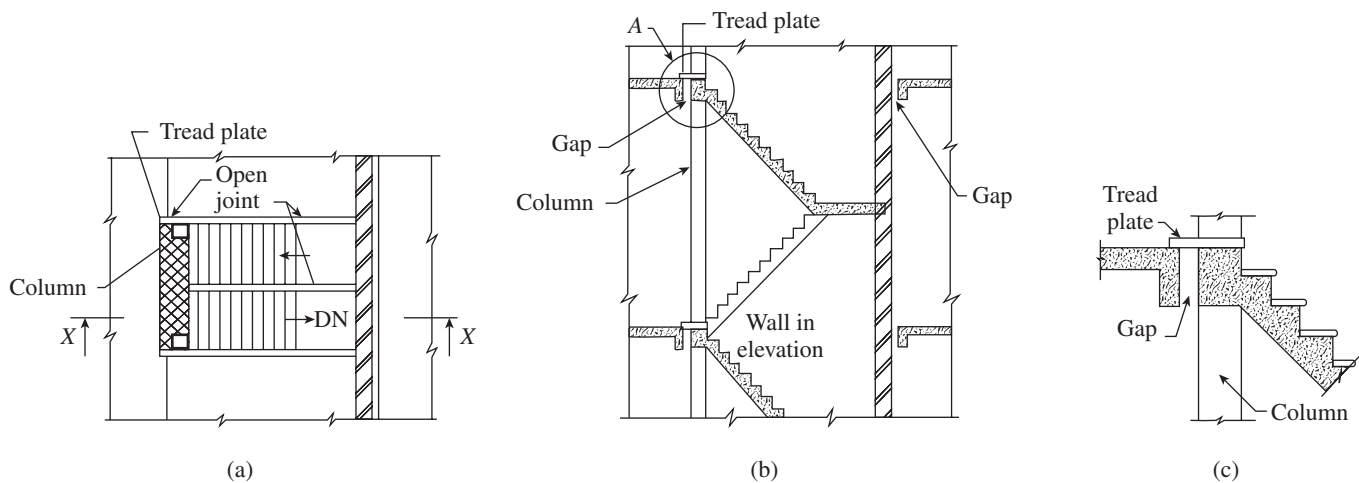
Separated staircases (a) Plan (b) Section at X-X (c) Detail at A
